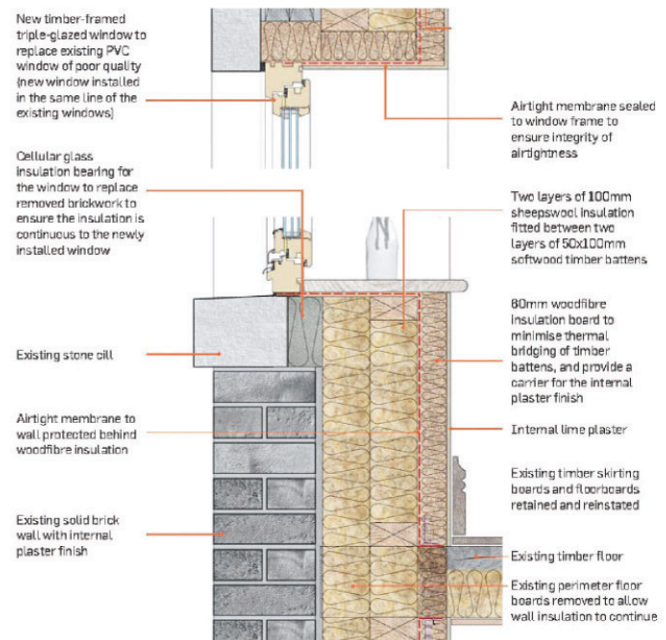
Brick wall retrofitted internally with 2 x 100 mm sheep-wool and 60 mm wood-fibre insulation
